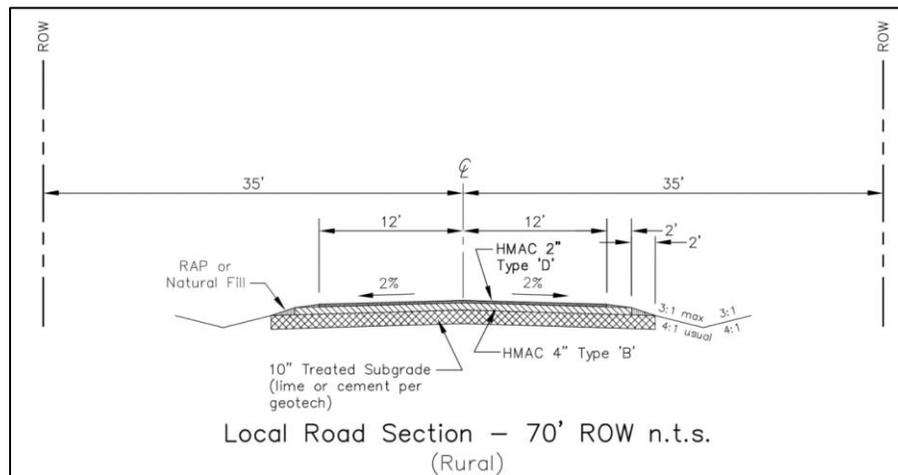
Local Road Section, Rural – 70' ROW n.t.s.
